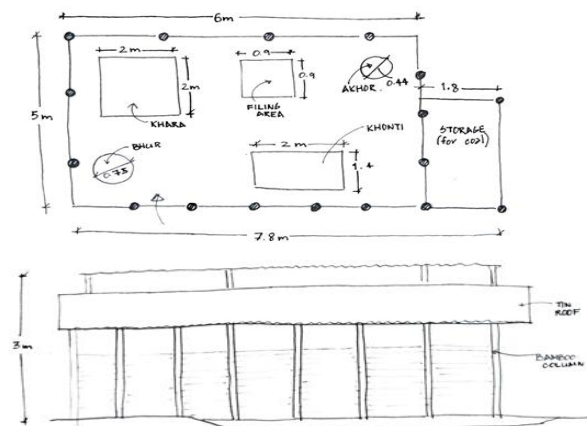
(a) Floor plan and (b) front elevation of surveyed workshop area (Source: Authors)
